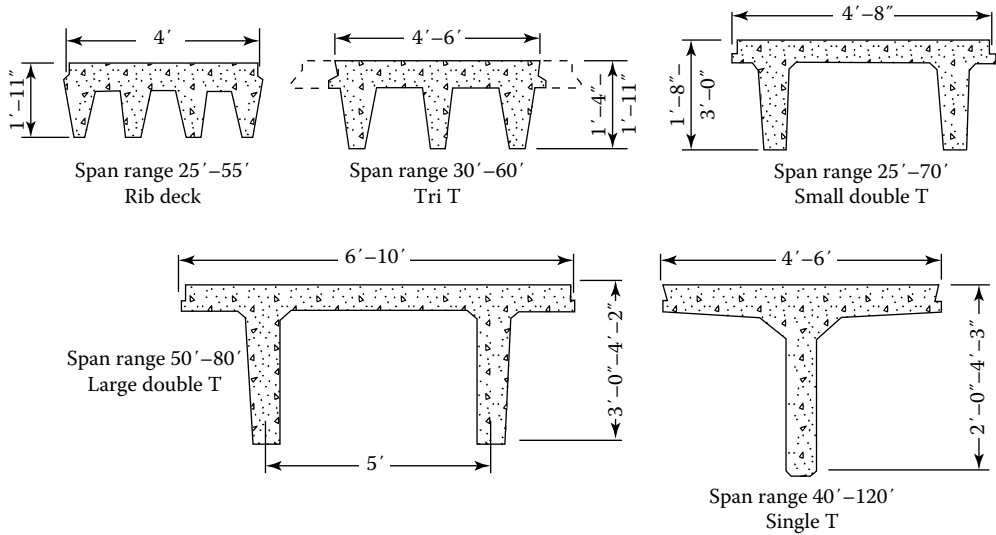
Forms of T-girders used for short-span highway bridges. (Adapted from Tokerud, R., *Prestressed Concrete Institute Journal*, 24, 42, 1979.)
